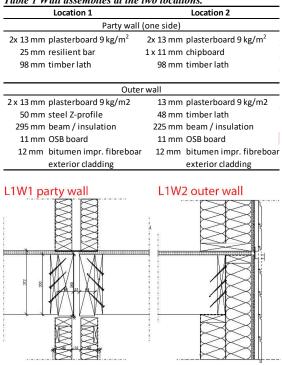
Cross section at the party wall and at the outer wall for location 1. See Table 1 for correct wall assembly.
